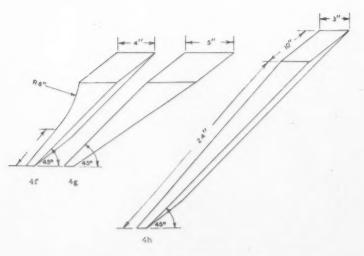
DIMENSIONS OF TEST SPECIMENS CAST AT ANGLE AS SHOWN.
